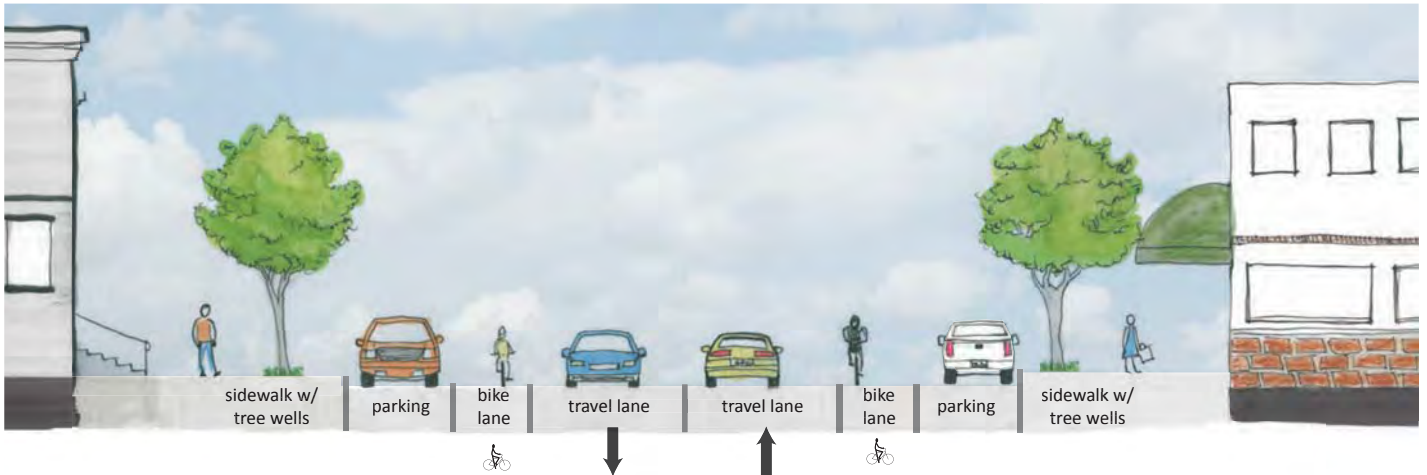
Collector Street Sections - Center / Village / Mixed Use
